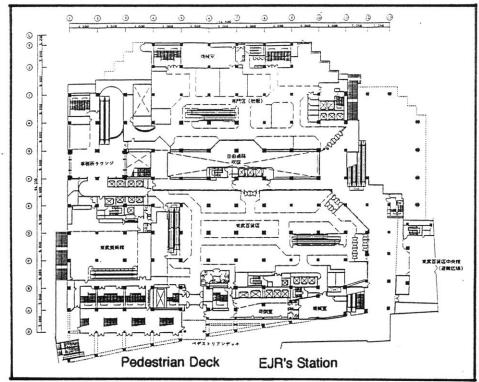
Plan of the Second Floor Source: Ikebukuro Terminal Building Company, Report on the Ikebukuro Terminal Building, 1993.
